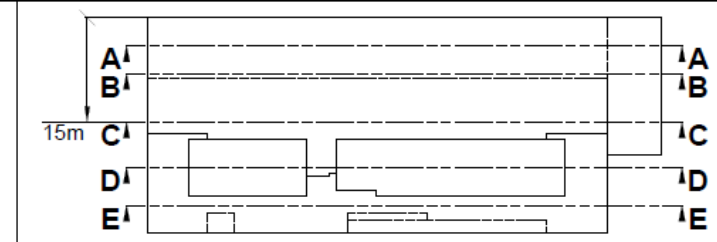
Section view of the tritium plant building at 15 m from the TKB.
